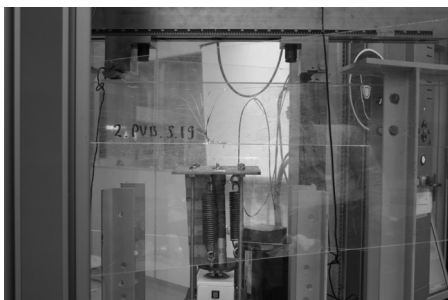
Typical model level I damage in 2.PVB.S specimen.
